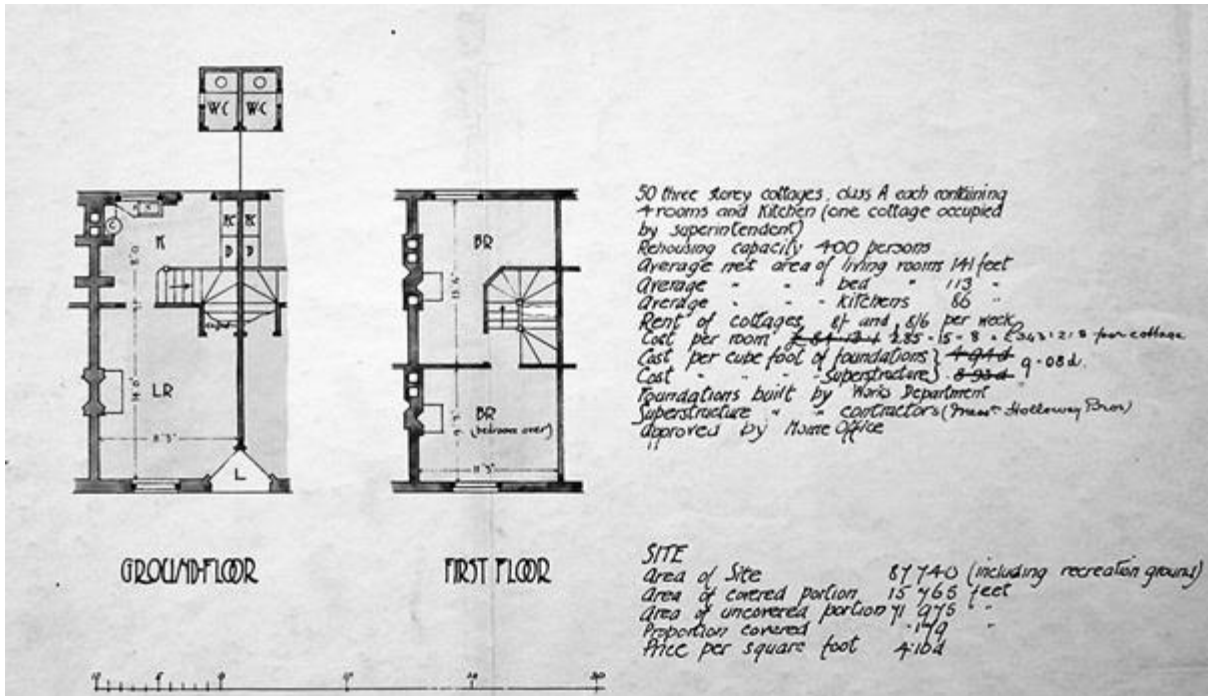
Idenden Cottages floor plans (LMA ref: LCC/AR/HS/03/059)
